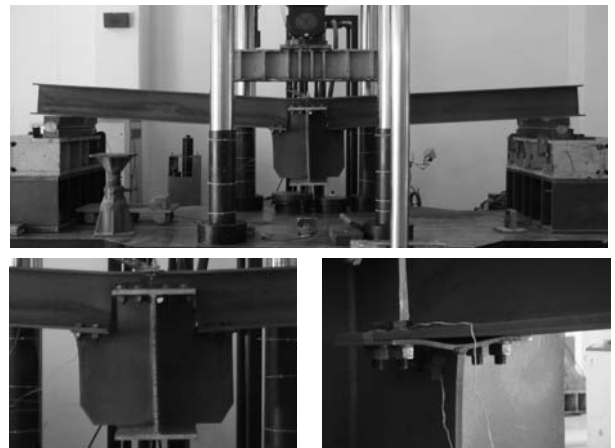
Failure of Test Specimen (New Temporary Bridge System)
